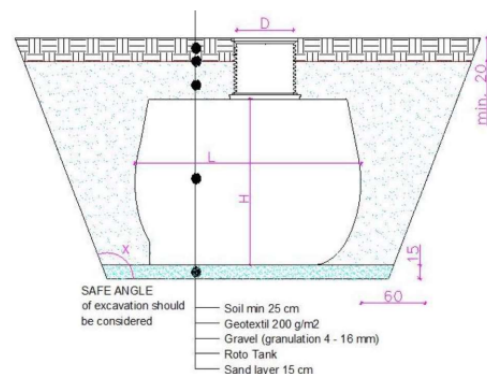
Manufacturers special instructions for simple underground installation of storage tanks - non traffic surface (method used in the pilot) (Source: <https://roto-group.eu/media/wysiwyg/V/prasalniki/navodila-vkop-EN.pdf>)
